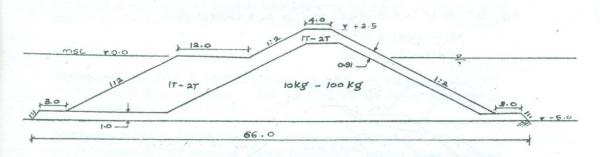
Trapezoidal Layered Breakwater with a Berm
